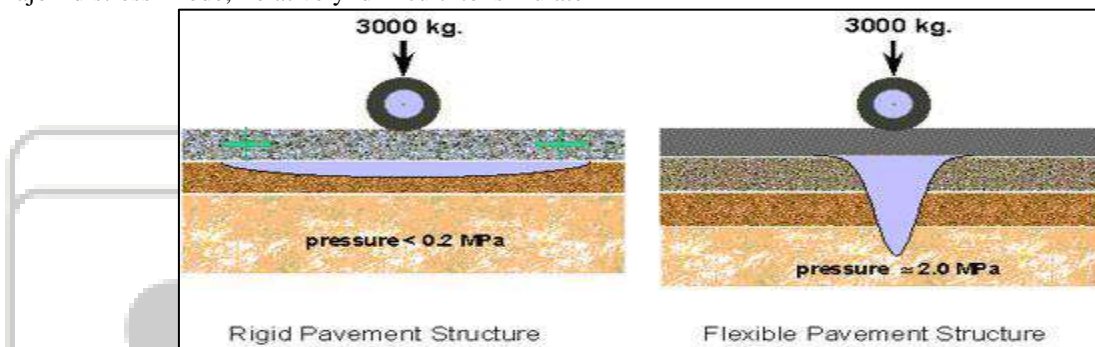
Load Transfer Mechanism Responsible for Failure of Pavement
